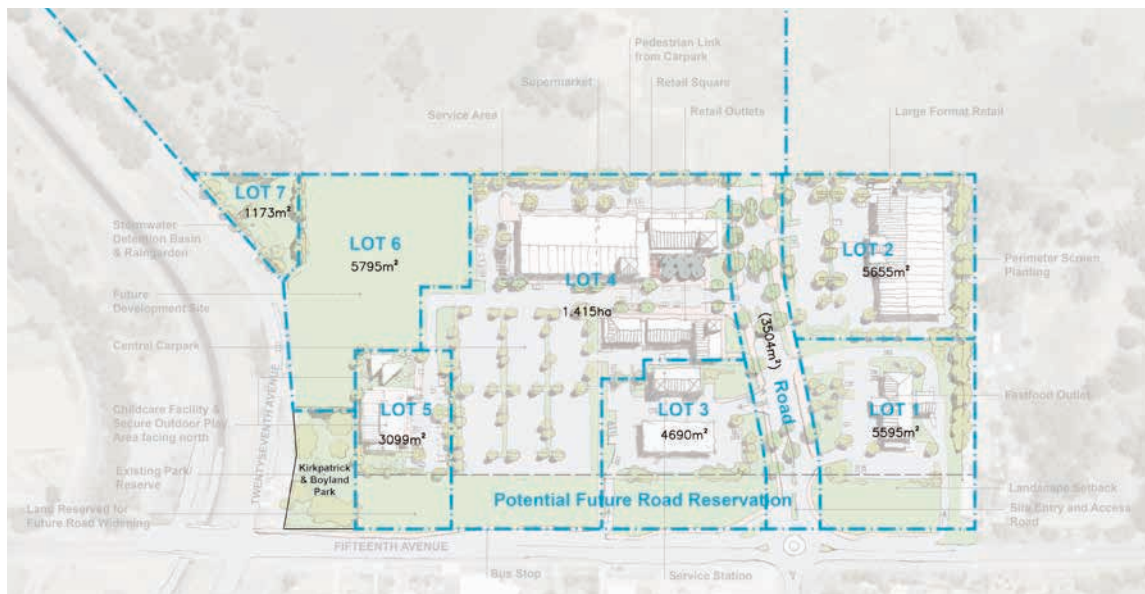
Indicative Site Plan and Proposed Lot Layout
